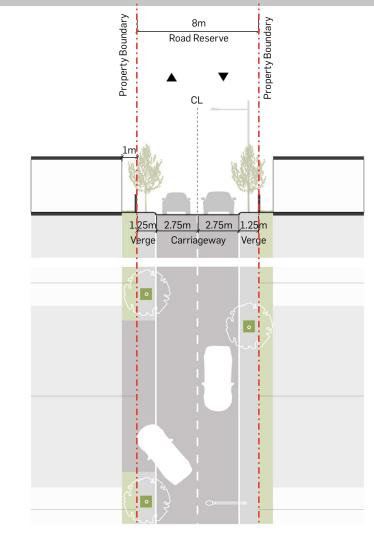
Indicative Street Section D-D' - Laneway - Type 8
